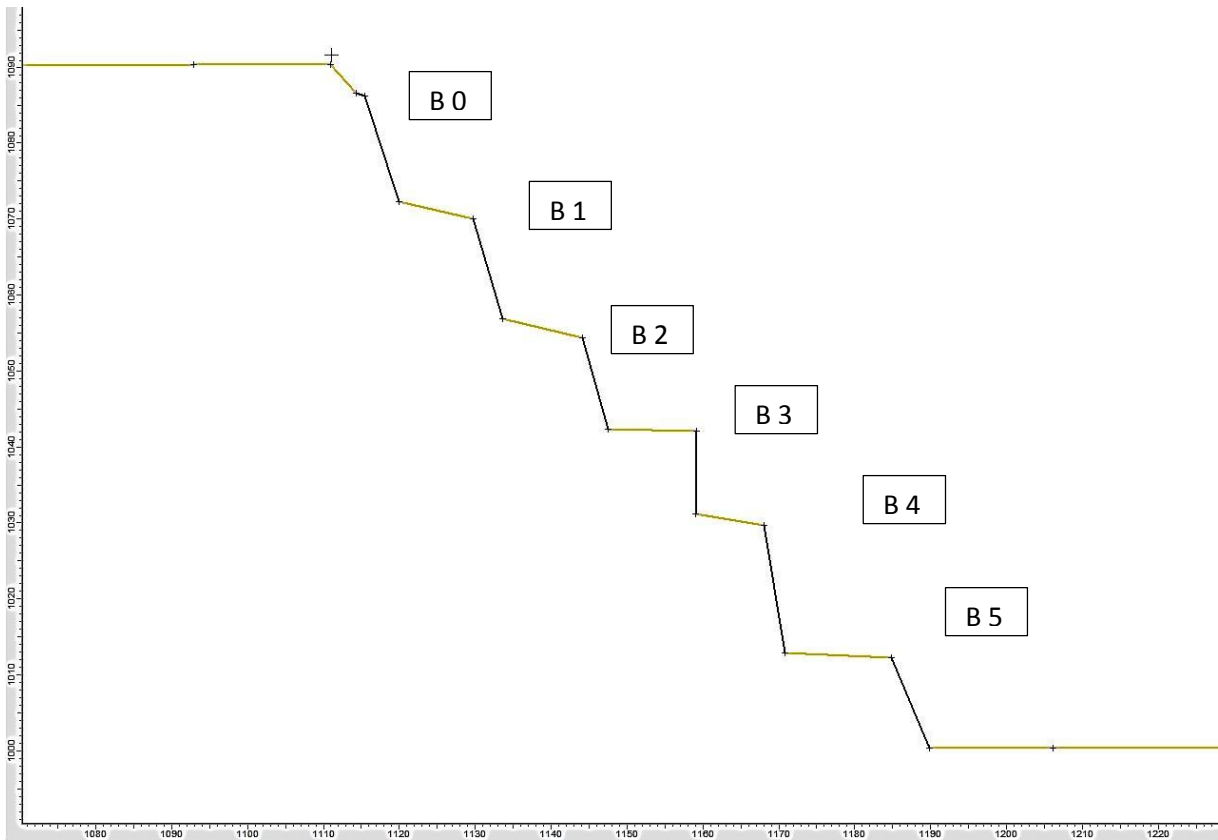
Pit section of in-situ test 1, the black sections are the only parts changed from previous rock-fall simulations.
